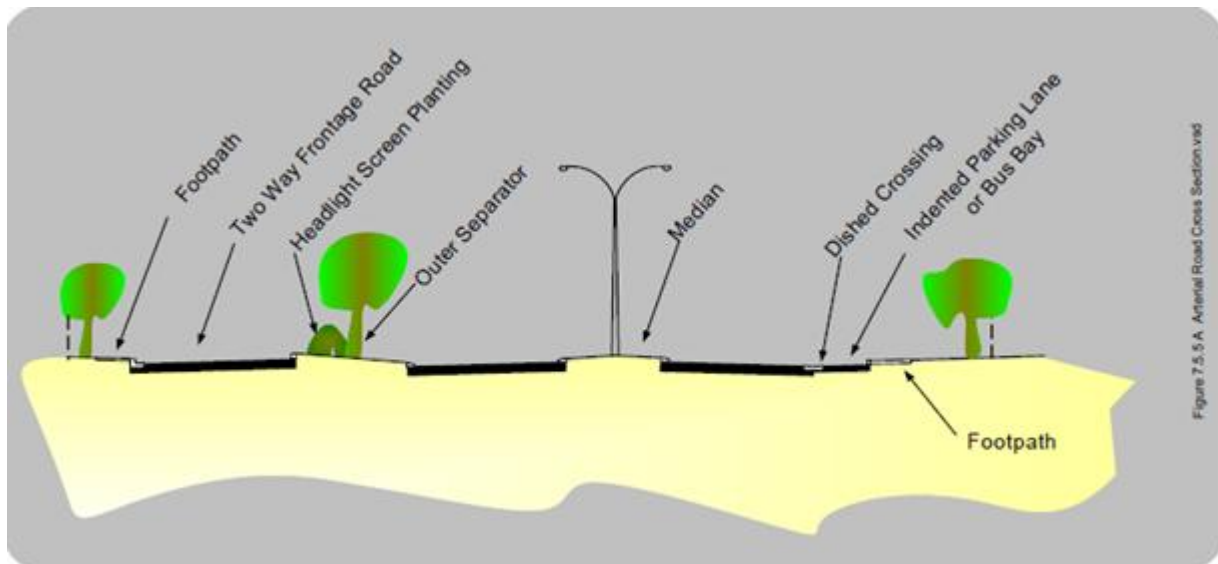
Arterial Road/Sub Arterial Cross Section (source: AACRA (2004), geometric design manual, page 7-17)
